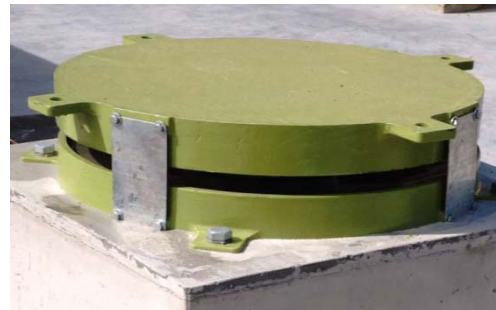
53 Victoria Street – Base Isolated building - under construction – friction pendulum bearing
